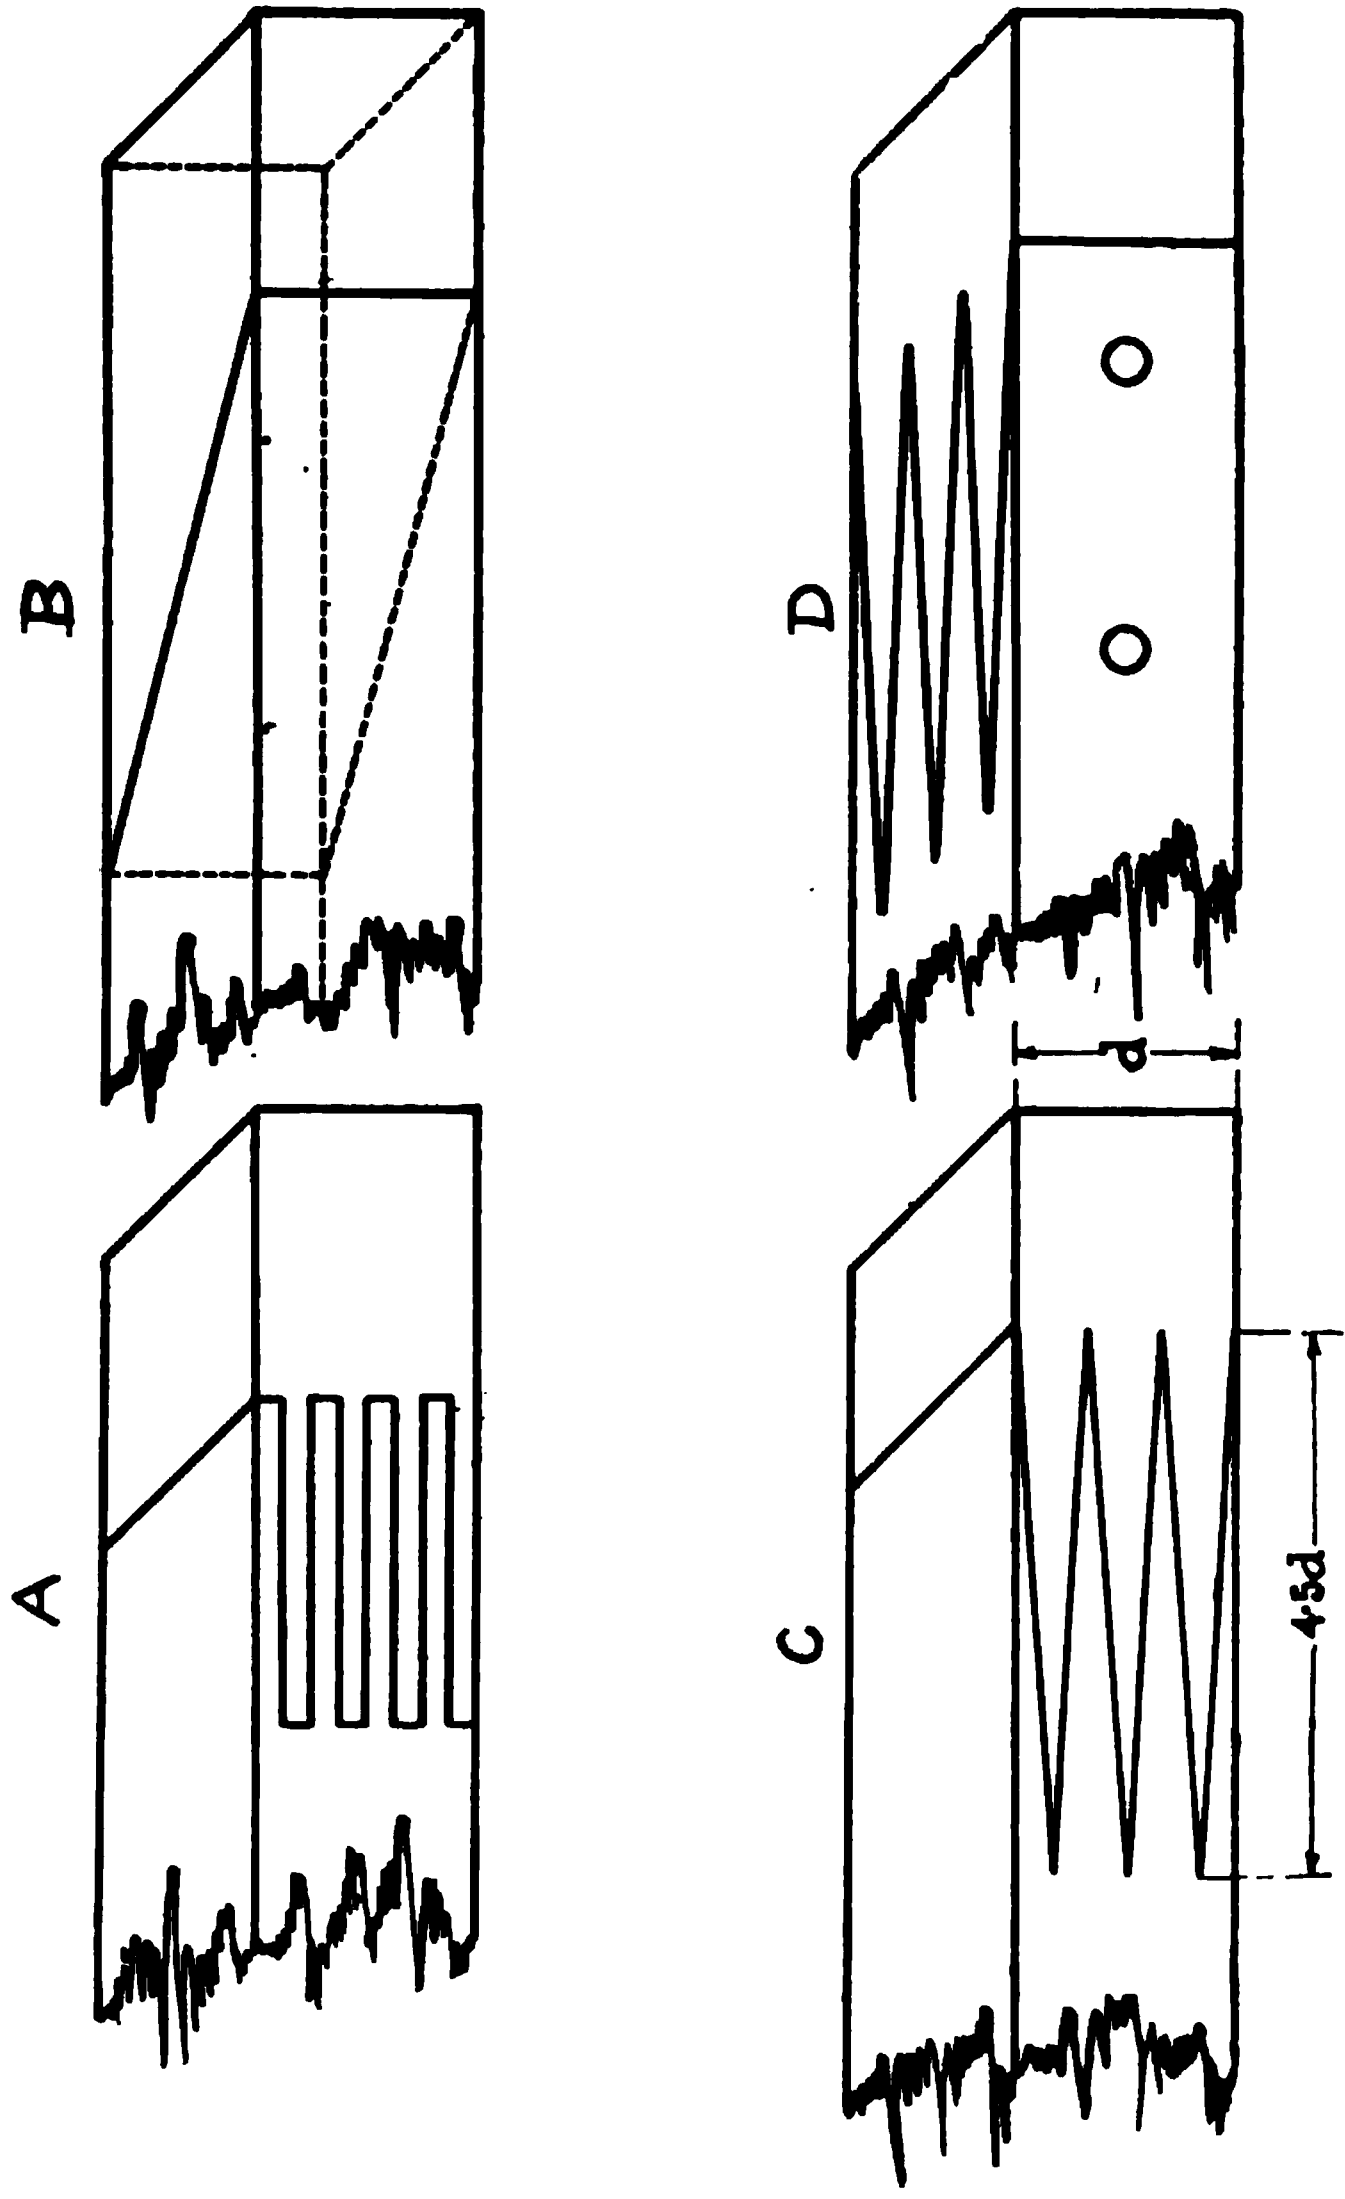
TYPES OF SPLICES IN GIRDER OR BEAMS.
